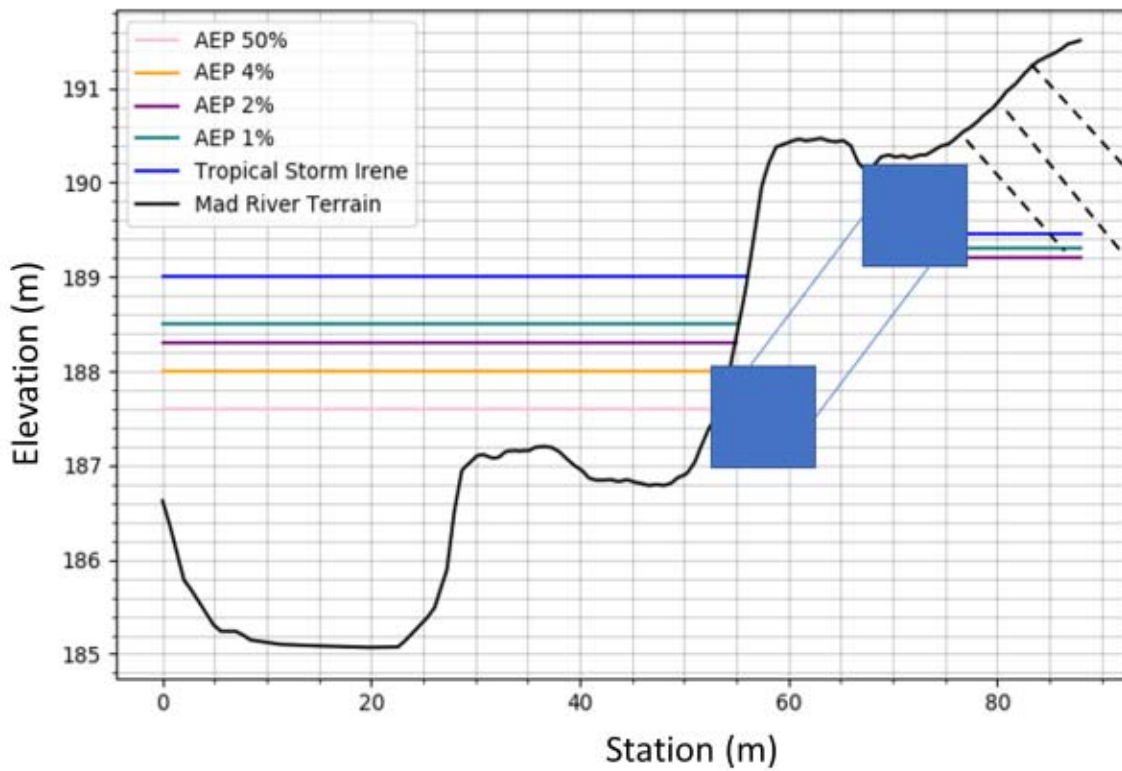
Image of Pony Hill Farm Rd culvert intervention (blue boxes) with associated water surface elevations and proposed soil removal (black dashed lines)
